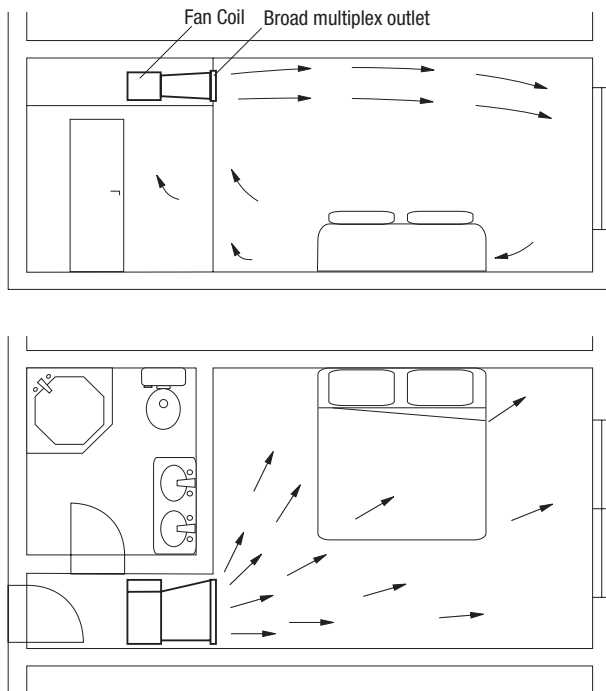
Basic jet pattern with the outlet positioned close to the right wall (related to air flow direction) of a hotel room
